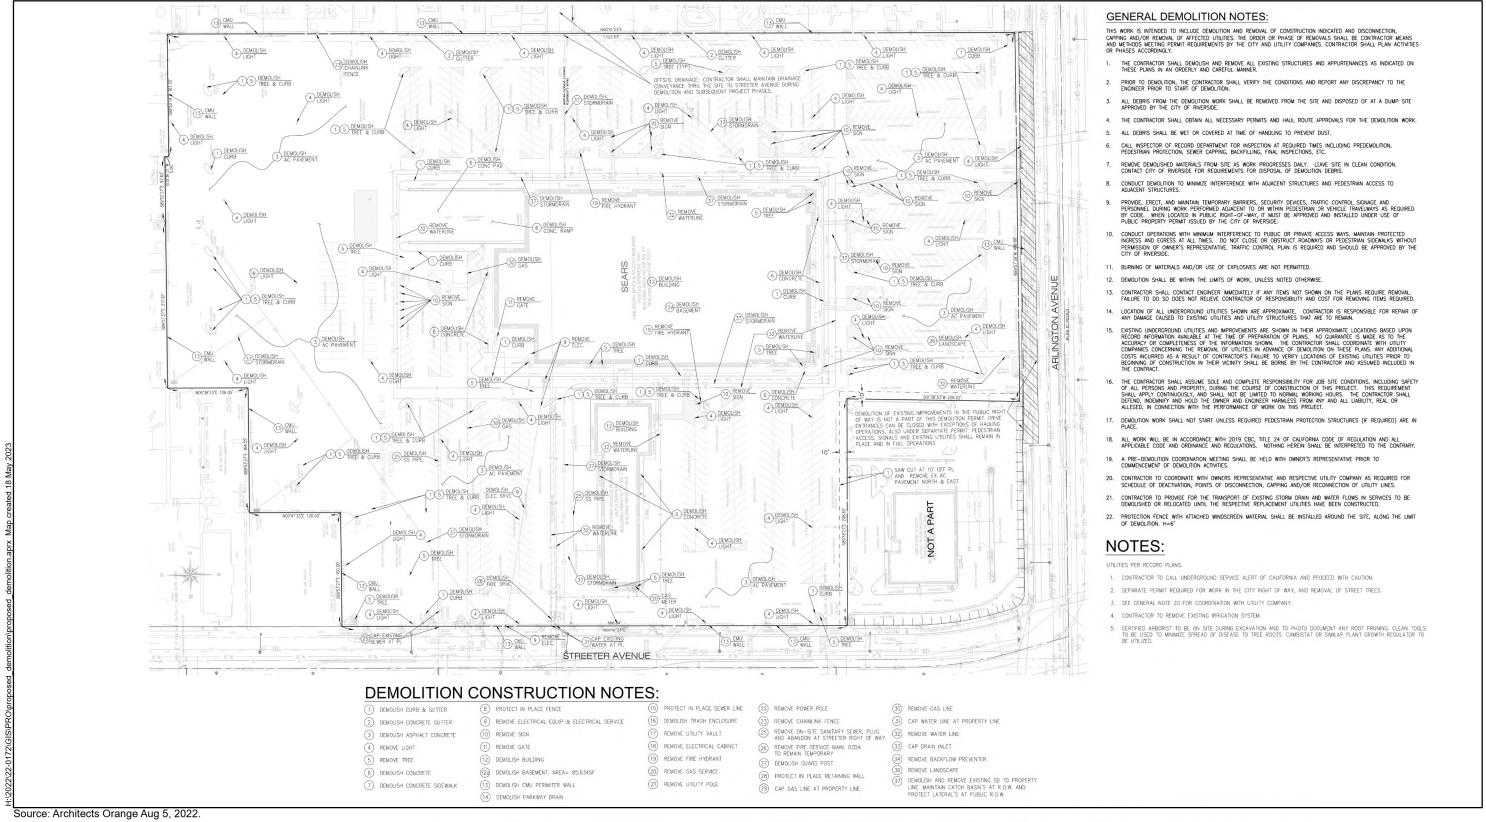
Proposed Demolition Plan Arlington Mixed Use Project
